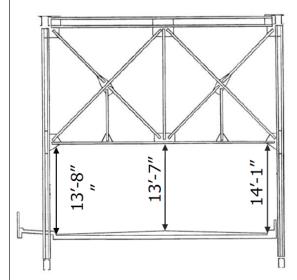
Cross-section view of a through truss bridge showing minimum vertical clearance.
